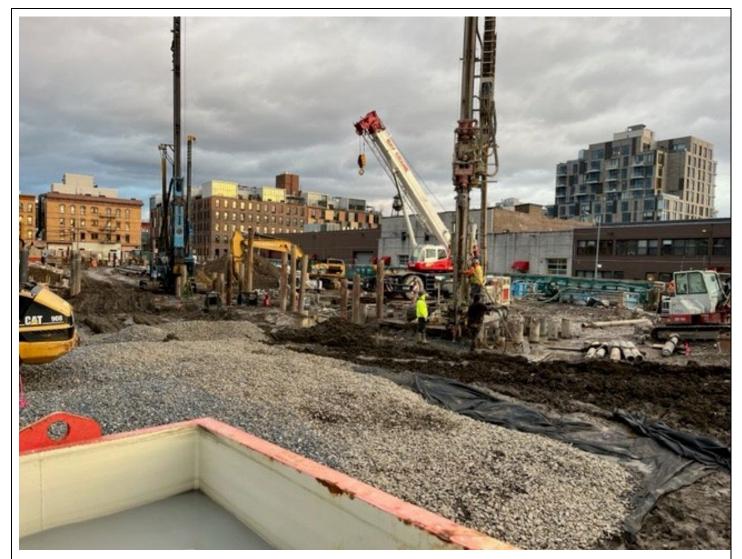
View facing southeast, CCJV performing caisson drilling in grid cell SC-4.
